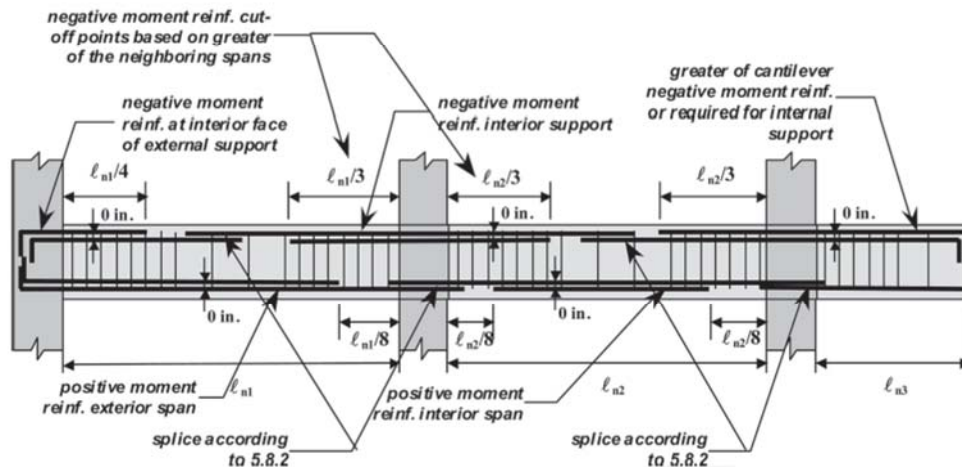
Reinforcement in girders that are part of the perimeter frame.
